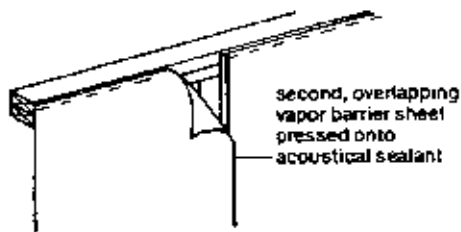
Technique for joining vapor barrier sheets on wall studs. (insulation not shown)
